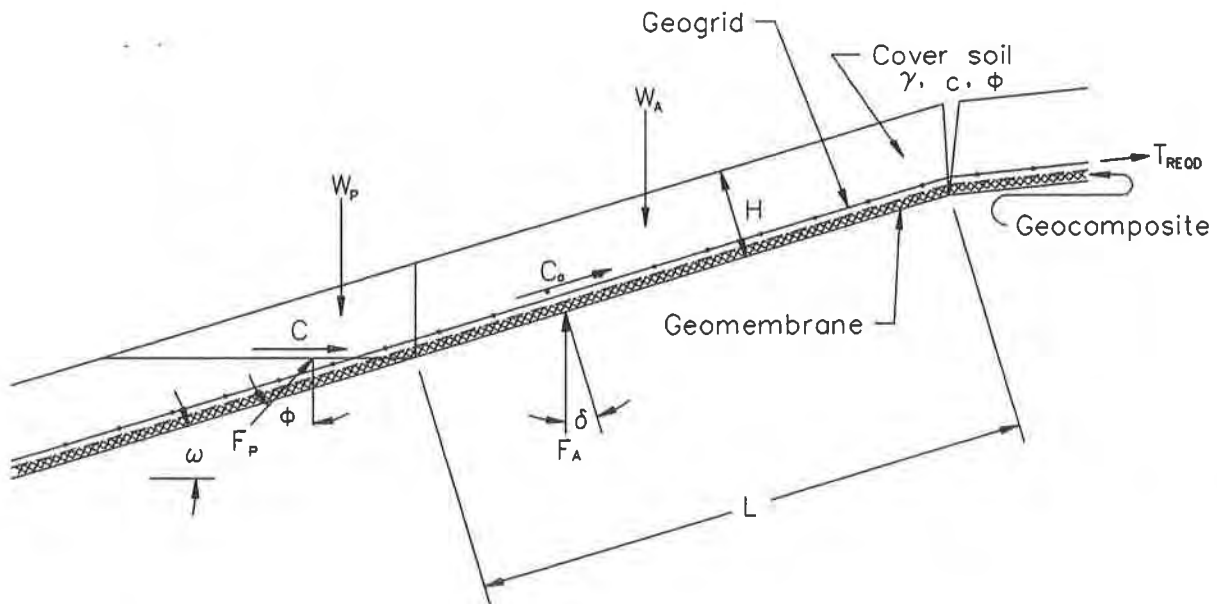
Cross section of forces acting on a geogrid reinforced cover soil system. Adapted from Koerner (1994)
